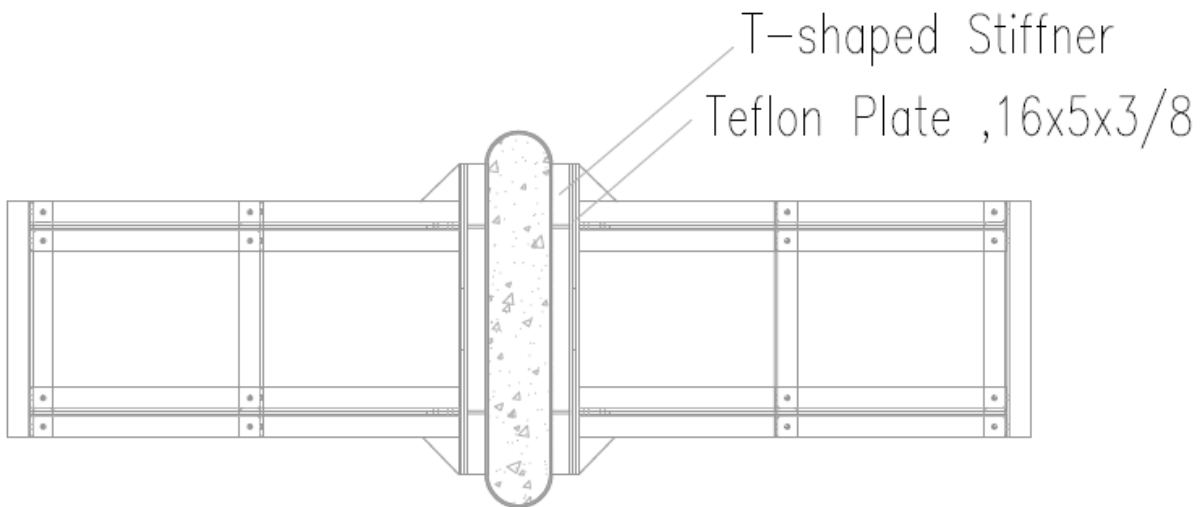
Plan of Lateral Support System in Case of Group NB Specimen
